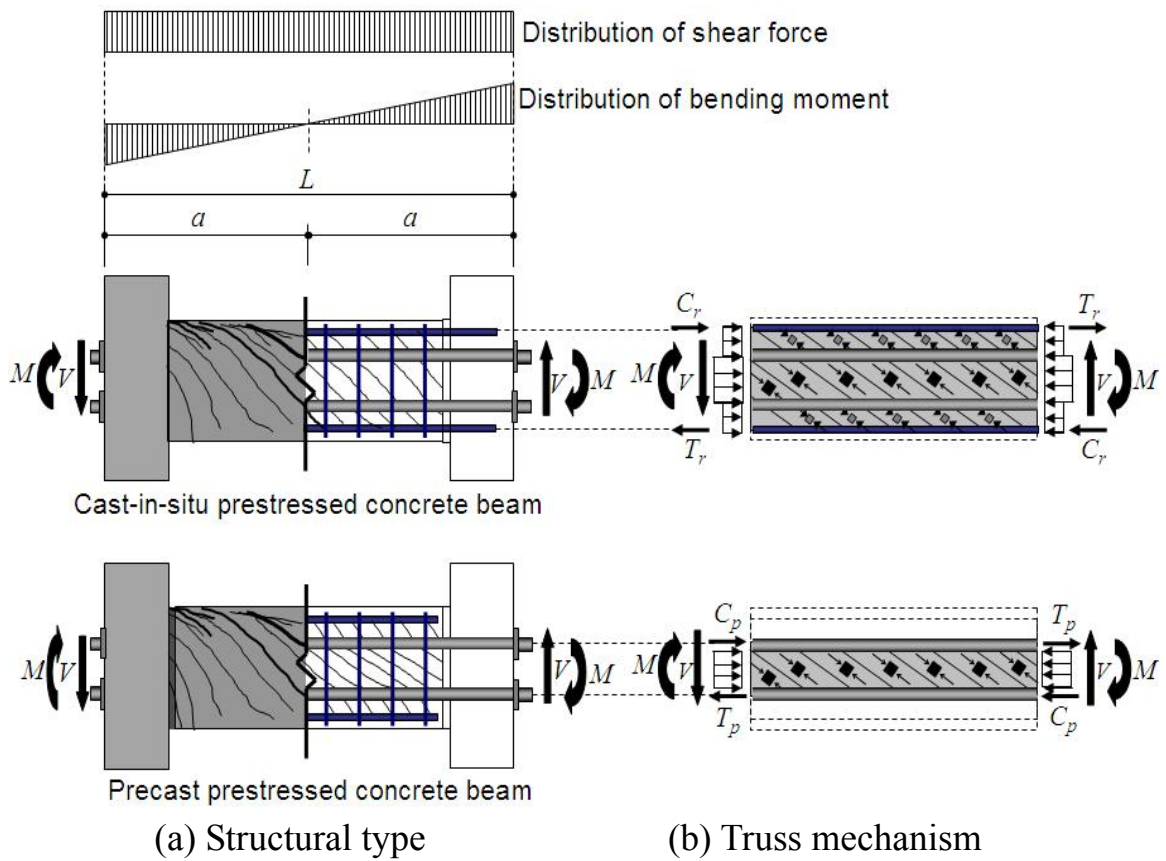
Shear resistance mechanism of cast-in-situ and precast prestressed concrete beam
